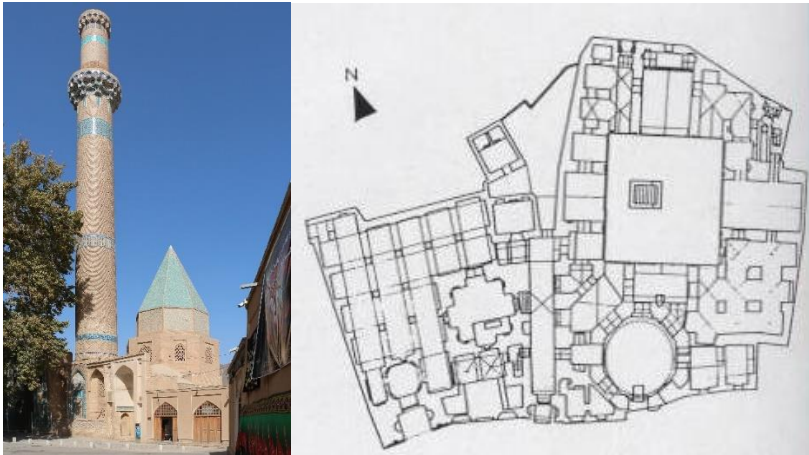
Sheikh Abdussamed Tomb exterior view (URL 8) and plan (Blair & Bloom, 1995)
